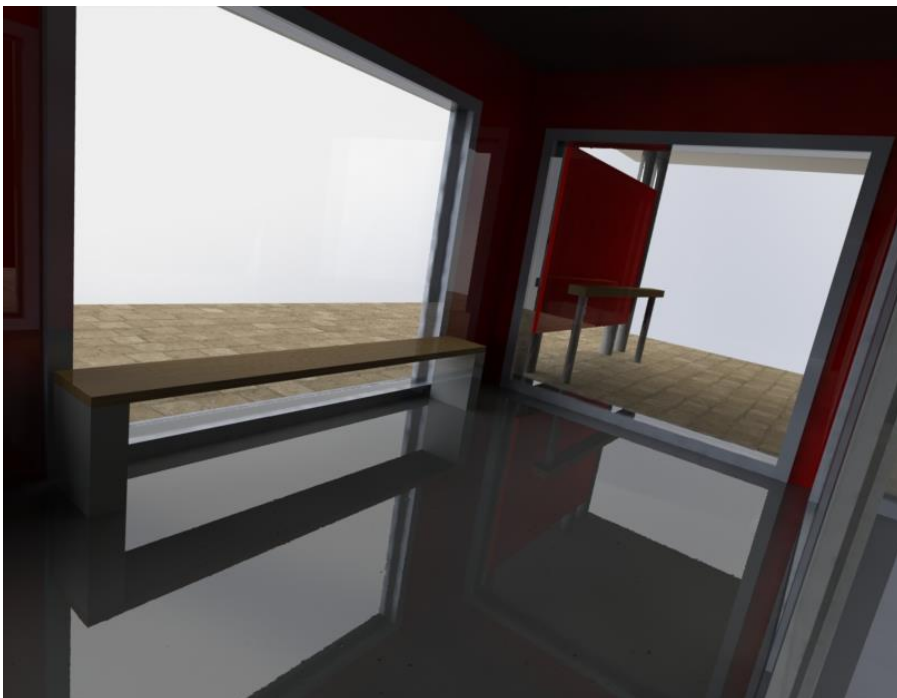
3D CAD Model of proposed shelter: interior view 2
